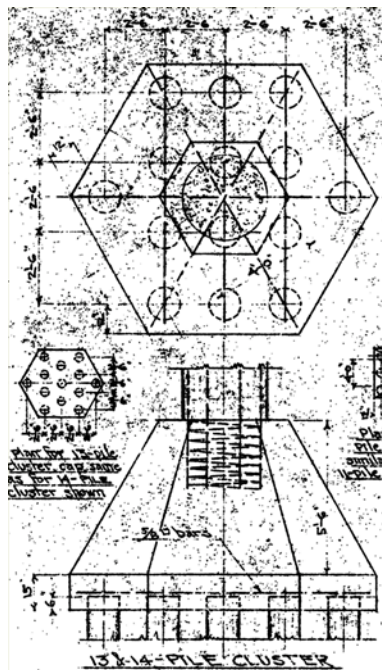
A typical pile cap for a 13- or 14-pile cluster. The driven timber piles extend 6 inches into the concrete pile cap. The concrete column reinforcing cage extends into the pile cap. At the bottom of the cap, above the piles is a dense two-directional reinforcing mat.
